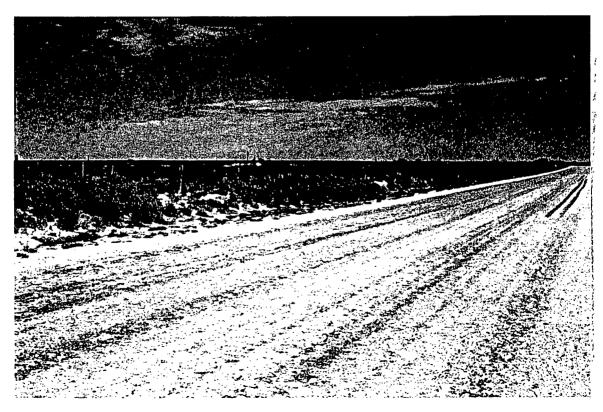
and #5 show where due to grading and maintaining of county road dirt has been pushed against fence line. This view is looking northwest to where the site will be constructed.
